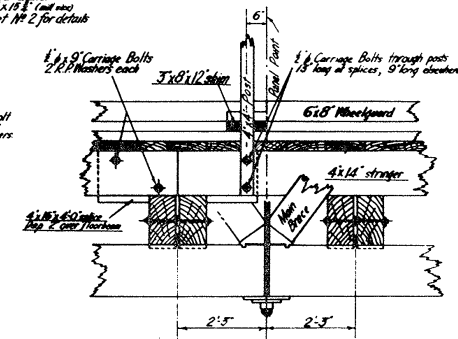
DETAIL OF FLOOR & FENCE 3/4" - 1ft
